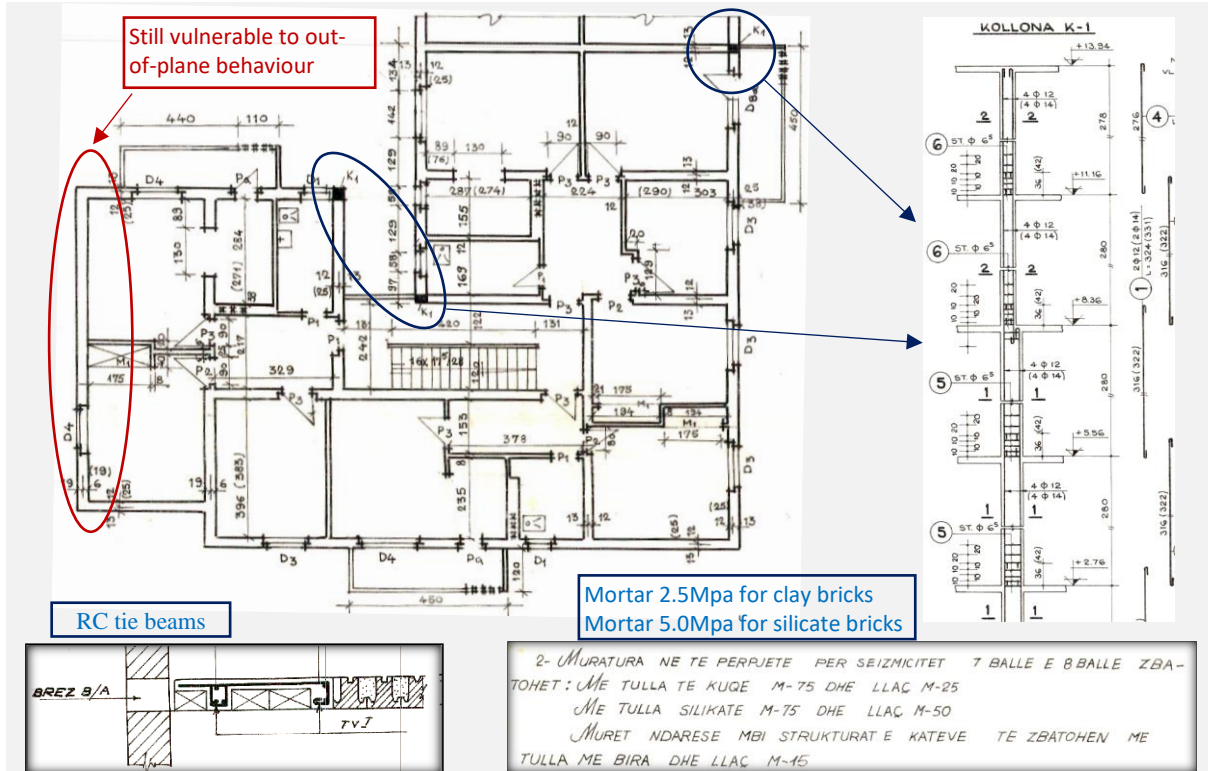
Improved 77/5 Model, by adding at least 3 RC columns at the corners; improving the mortar strength; reinforced concrete tie beams were also added at the floor levels
